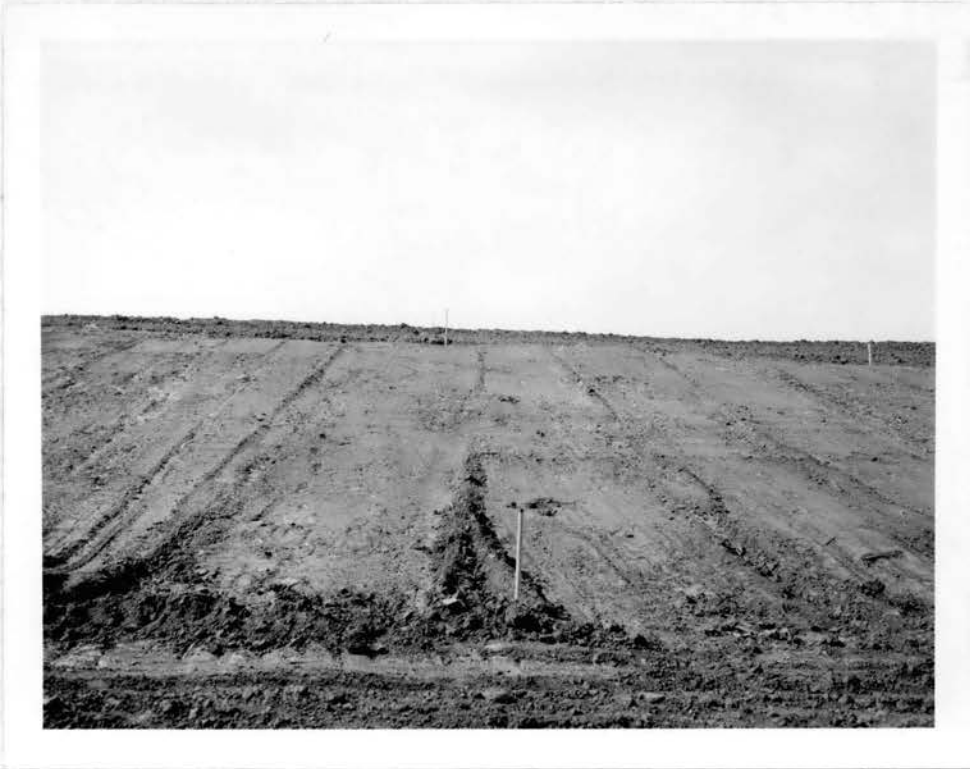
Gages on Site 3⁴ showing Gages Nos. 1, 2 and 3 during construction of the dam.
